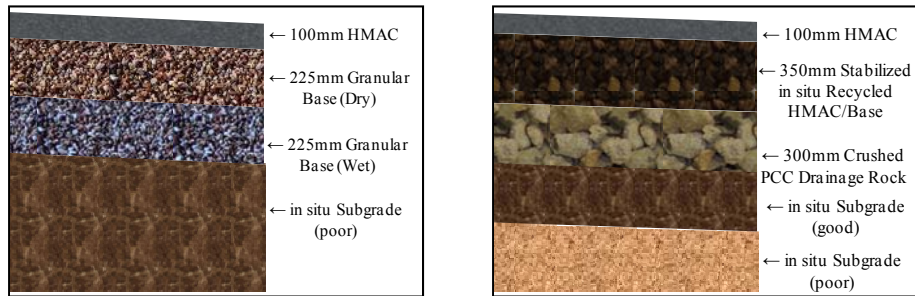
Road Rehabilitation Pavement Structures – 8th Street East (right turn lane)
